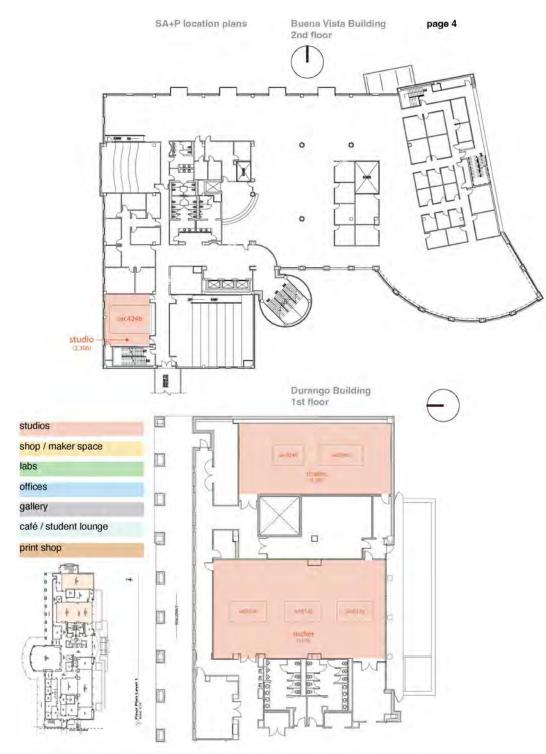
UTSA Buena Vista Building, 2nd floor Fig. 12 UTSA Durango Building, first floor
